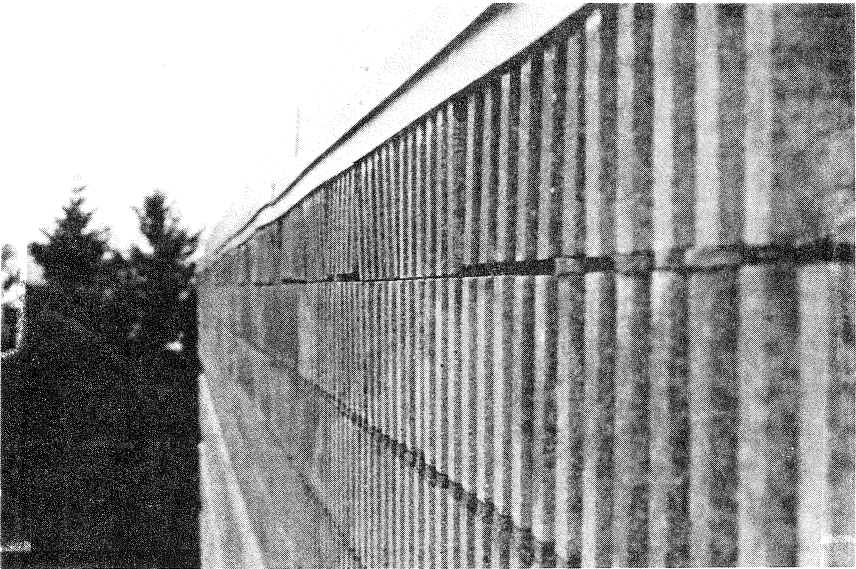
Deteriorated Mortar Leaves Blockwork Unstable
